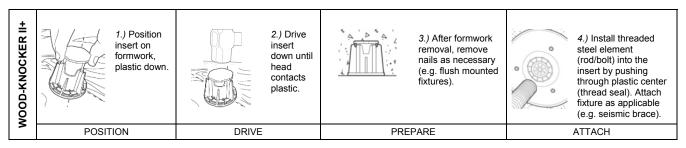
A—WOOD KNOCKER II+ CONCRETE INSERTS, MANUFACTUER PUBLISHED INSTALLATION INSTRUCTIONS (MPII)
